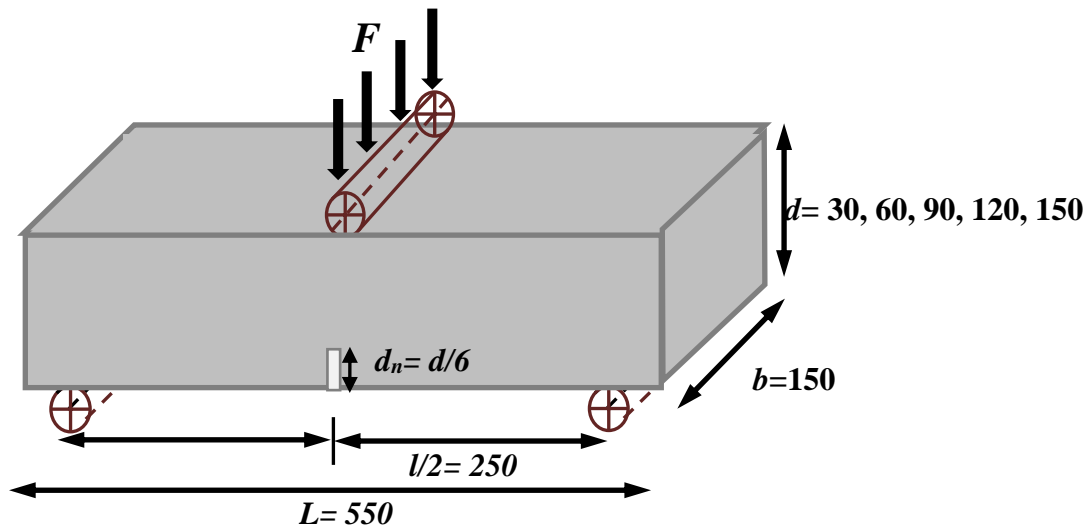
Specimen geometry (all the dimensions are in mm).
